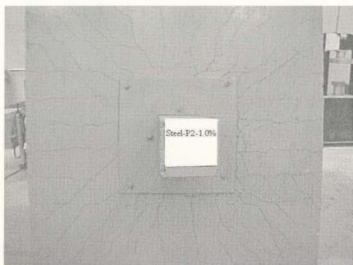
Specimen Steel-P2-1.0% after final testing
